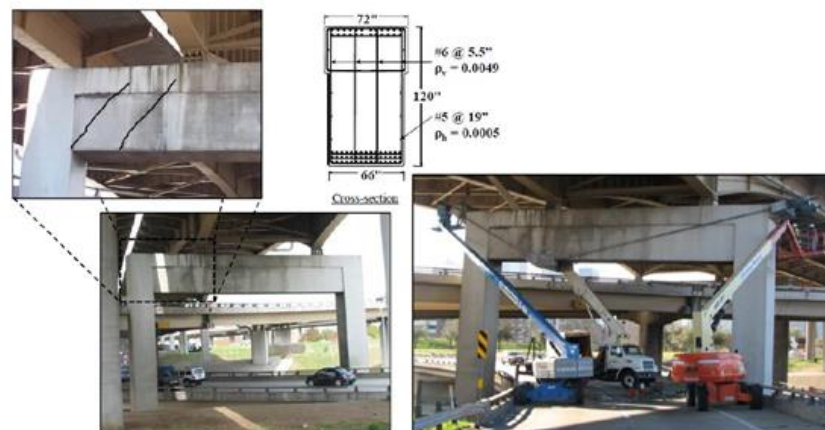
Deep Beam Damage in A Bridge Structure [2].
